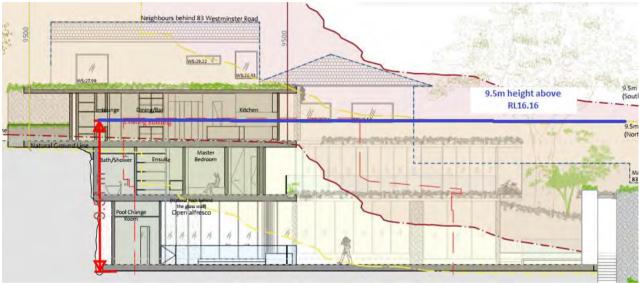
Section B showing 9.5m height above existing ground level established by the current building on site. Source: Applicant's architectural plans, marked up by CPS.
